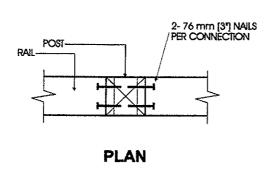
Exterior Connection: Top Rail Nailed to Post
